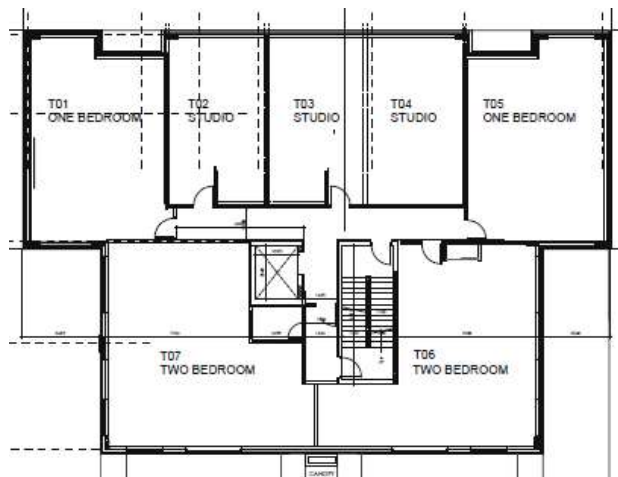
Exhibit V: Proposed sixth and seventh floor plans, each with three (3) studios, two (2) 1-bedroom units and two (2) 2-bedroom units
